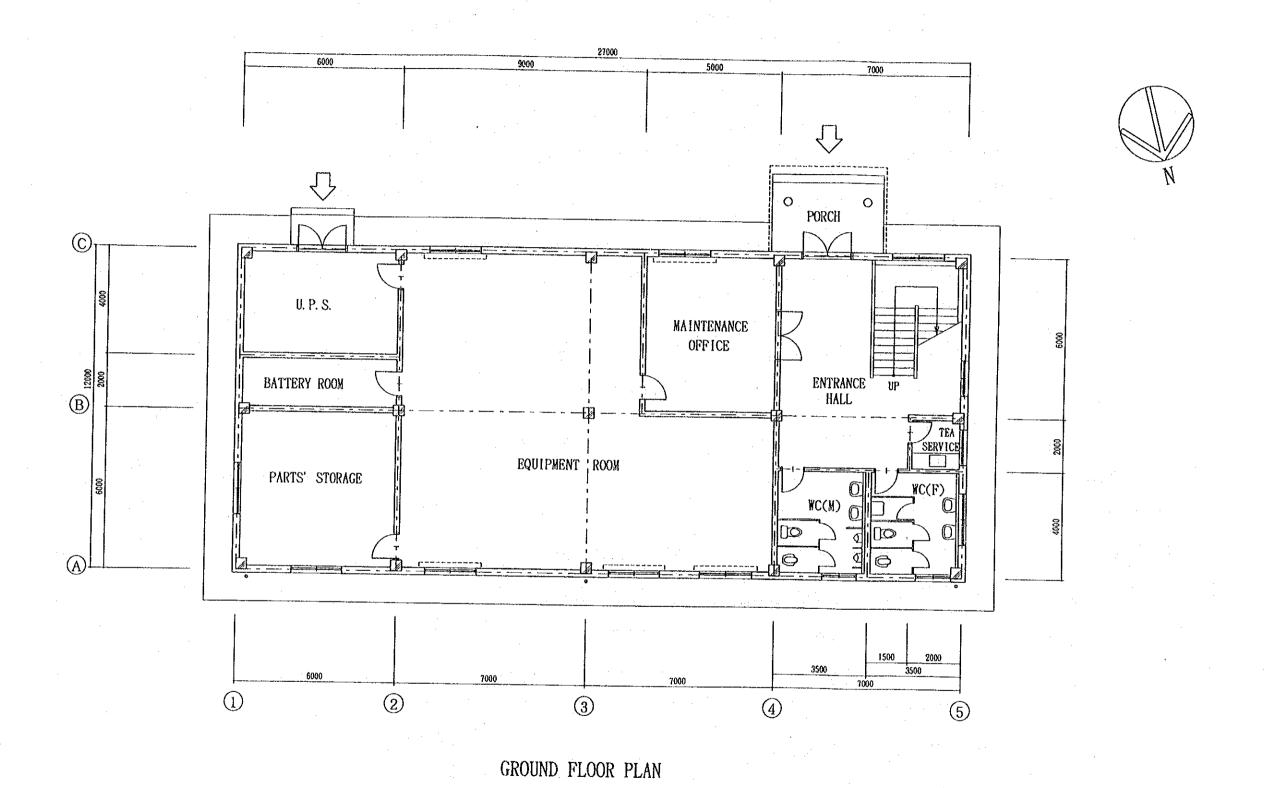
Radar Operations Building Ground Floor Plan
